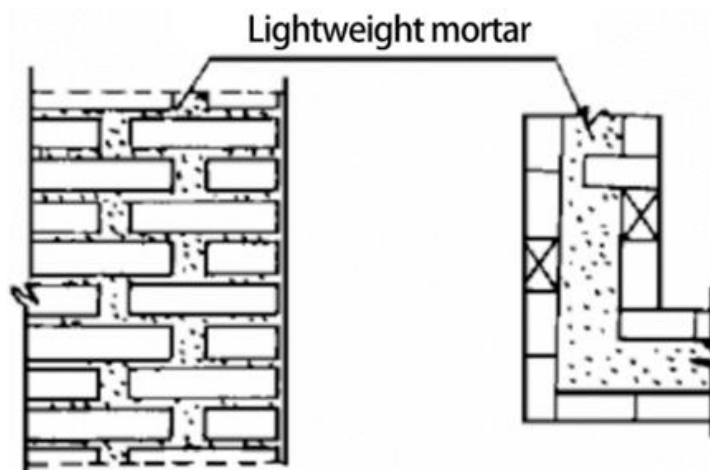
Masonry method of Fengtian Station’s wall [3].
